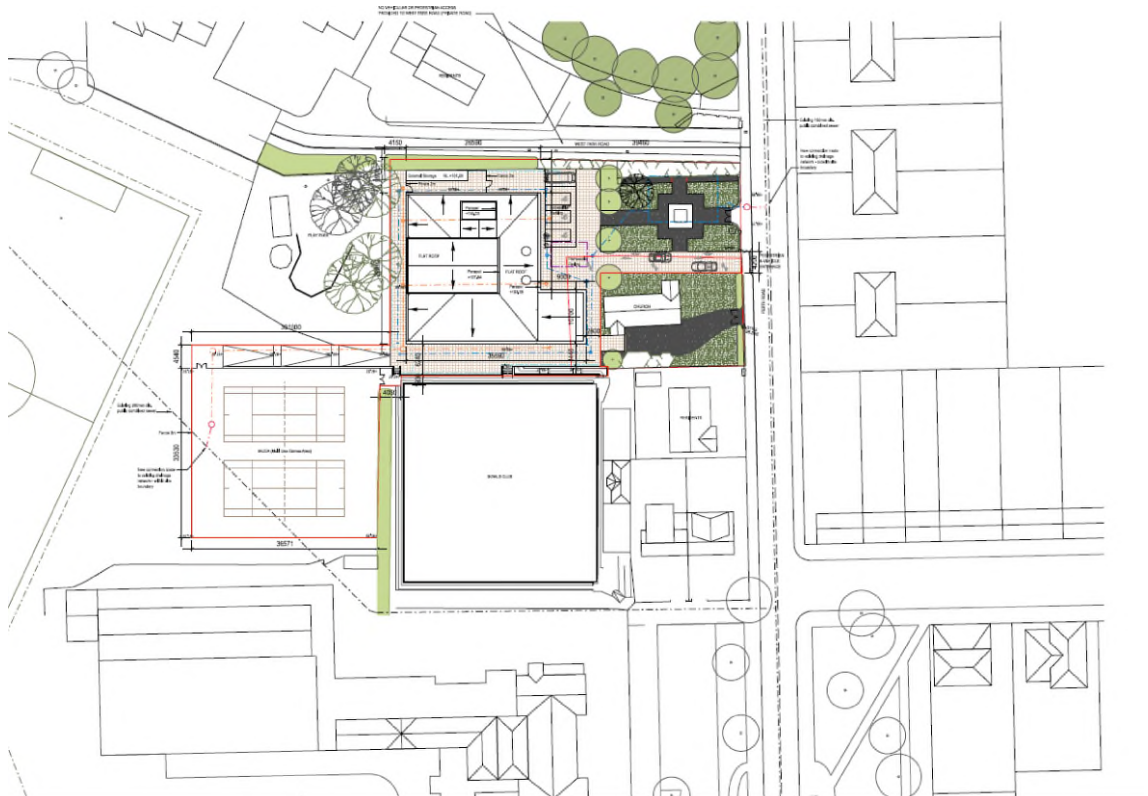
Extract from the Proposed Site Plan (Lee Boyd Architects, 2023) showing the location of the components of the Proposed Development in relation to St Columba's Episcopal Church.
